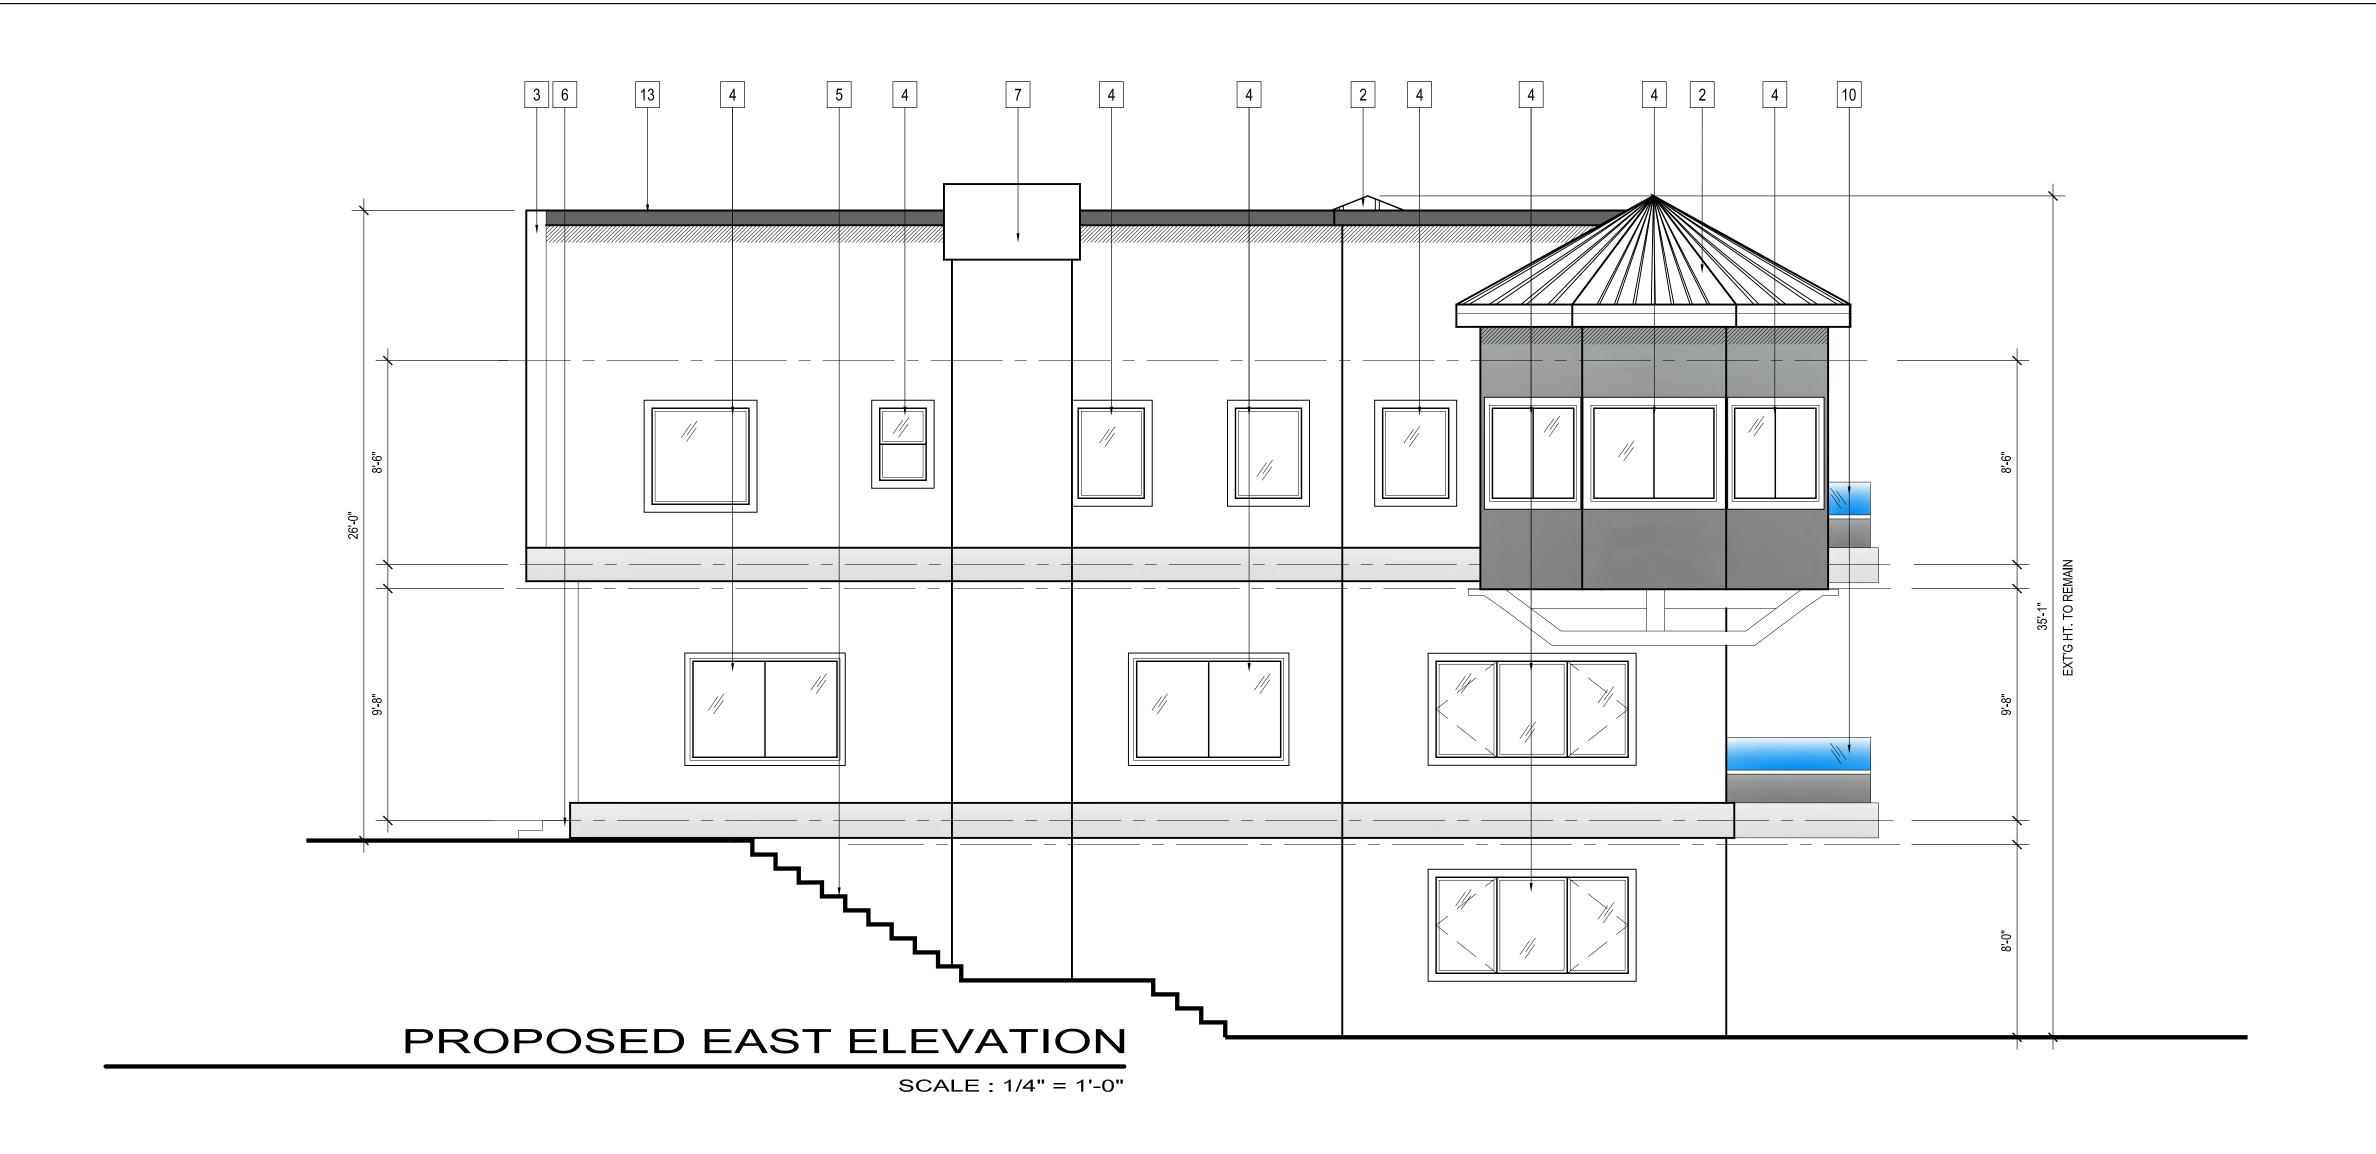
DETAIL ELEVATIONS / EXT'G AND PROPOSED
